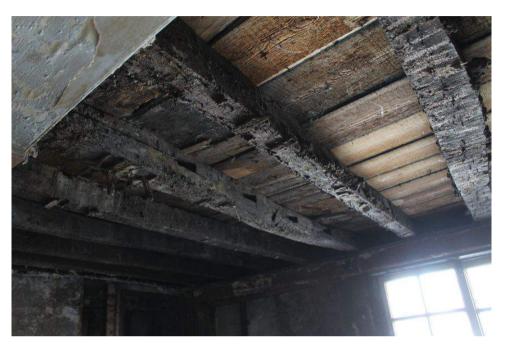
Internal southern elevation of first-floor in Building B. Photograph taken facing south.
